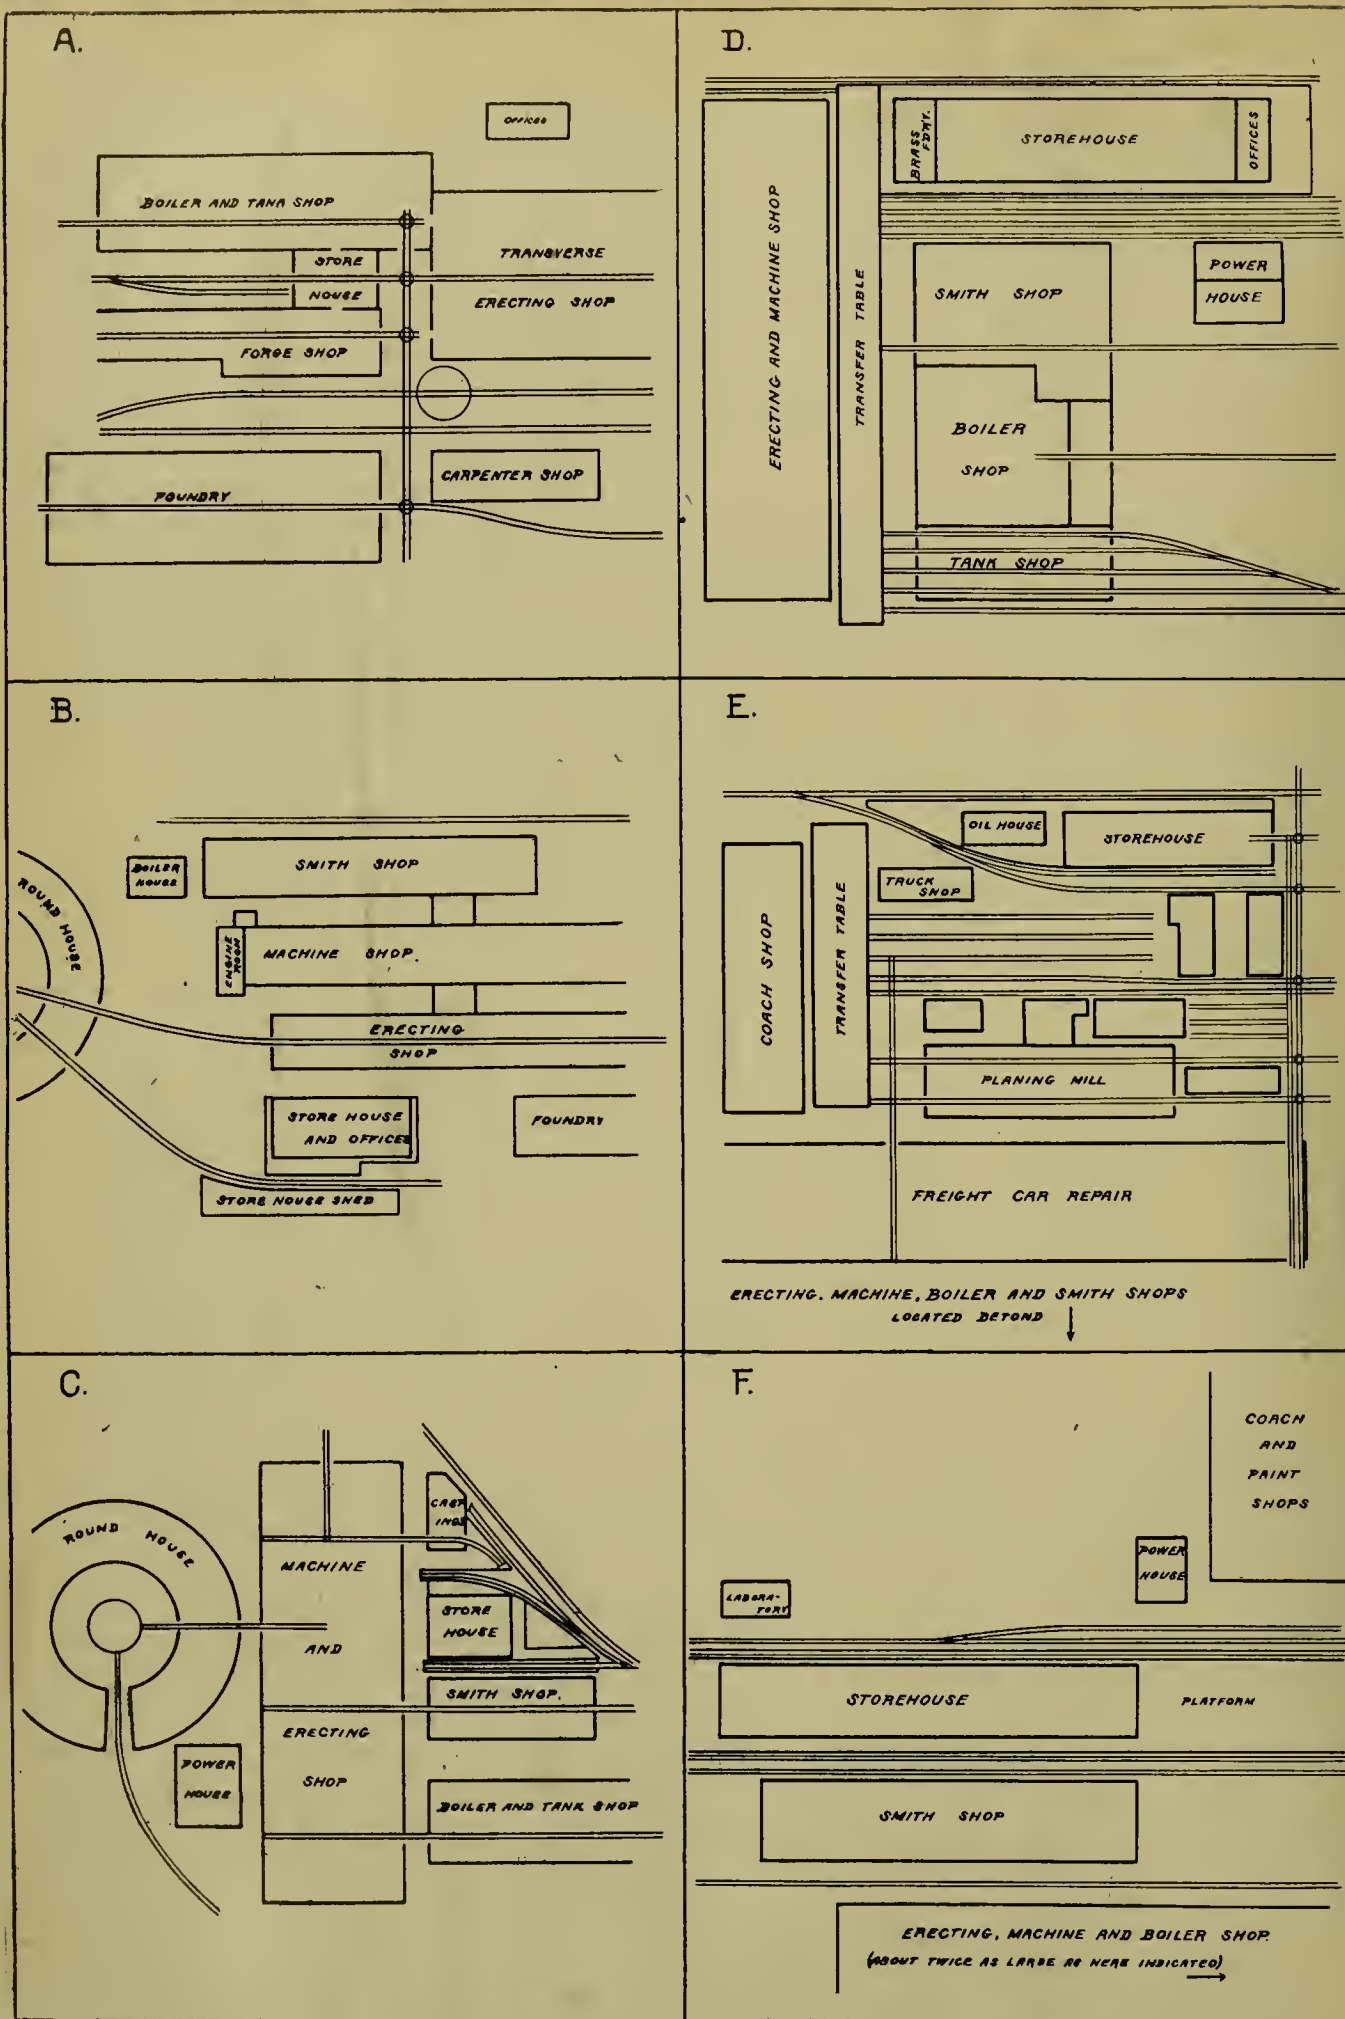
TYPICAL STOREHOUSE TRACK ARRANGEMENTS.
